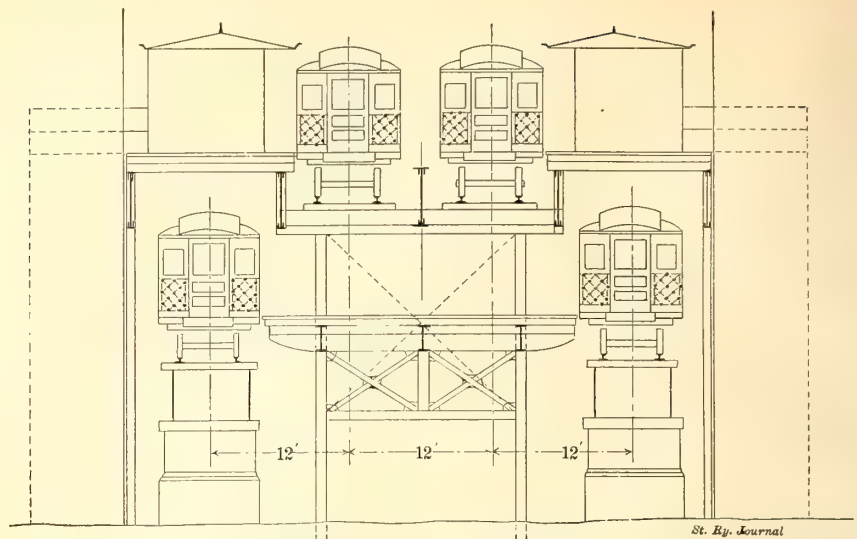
CROSS SECTION OF PROPOSED ELEVATED STRUCTURE AT 138TH STREET, BRONX BOROUGH
